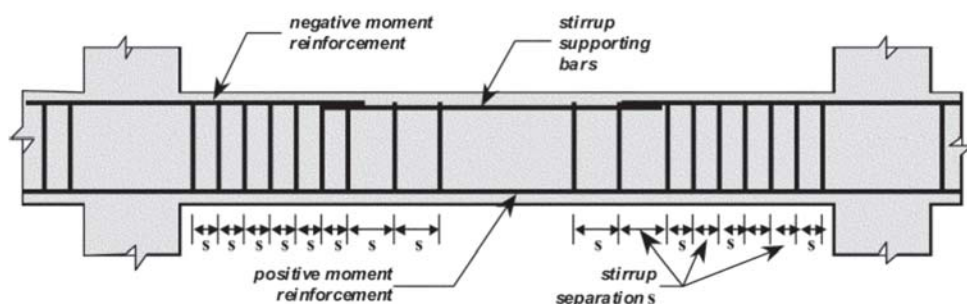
Typical stirrup spacing along the girder, beam, or joist.
